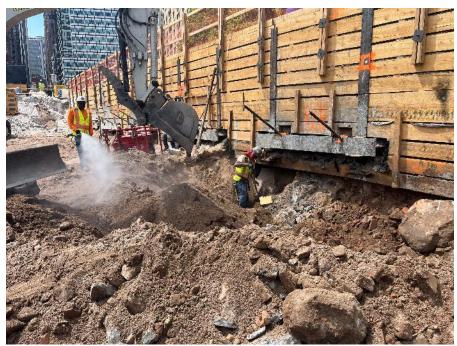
CCJV excavating soil/fill within waste characterization cell WC05 to expose soldier piles for T-bracket installation (facing northwest)
